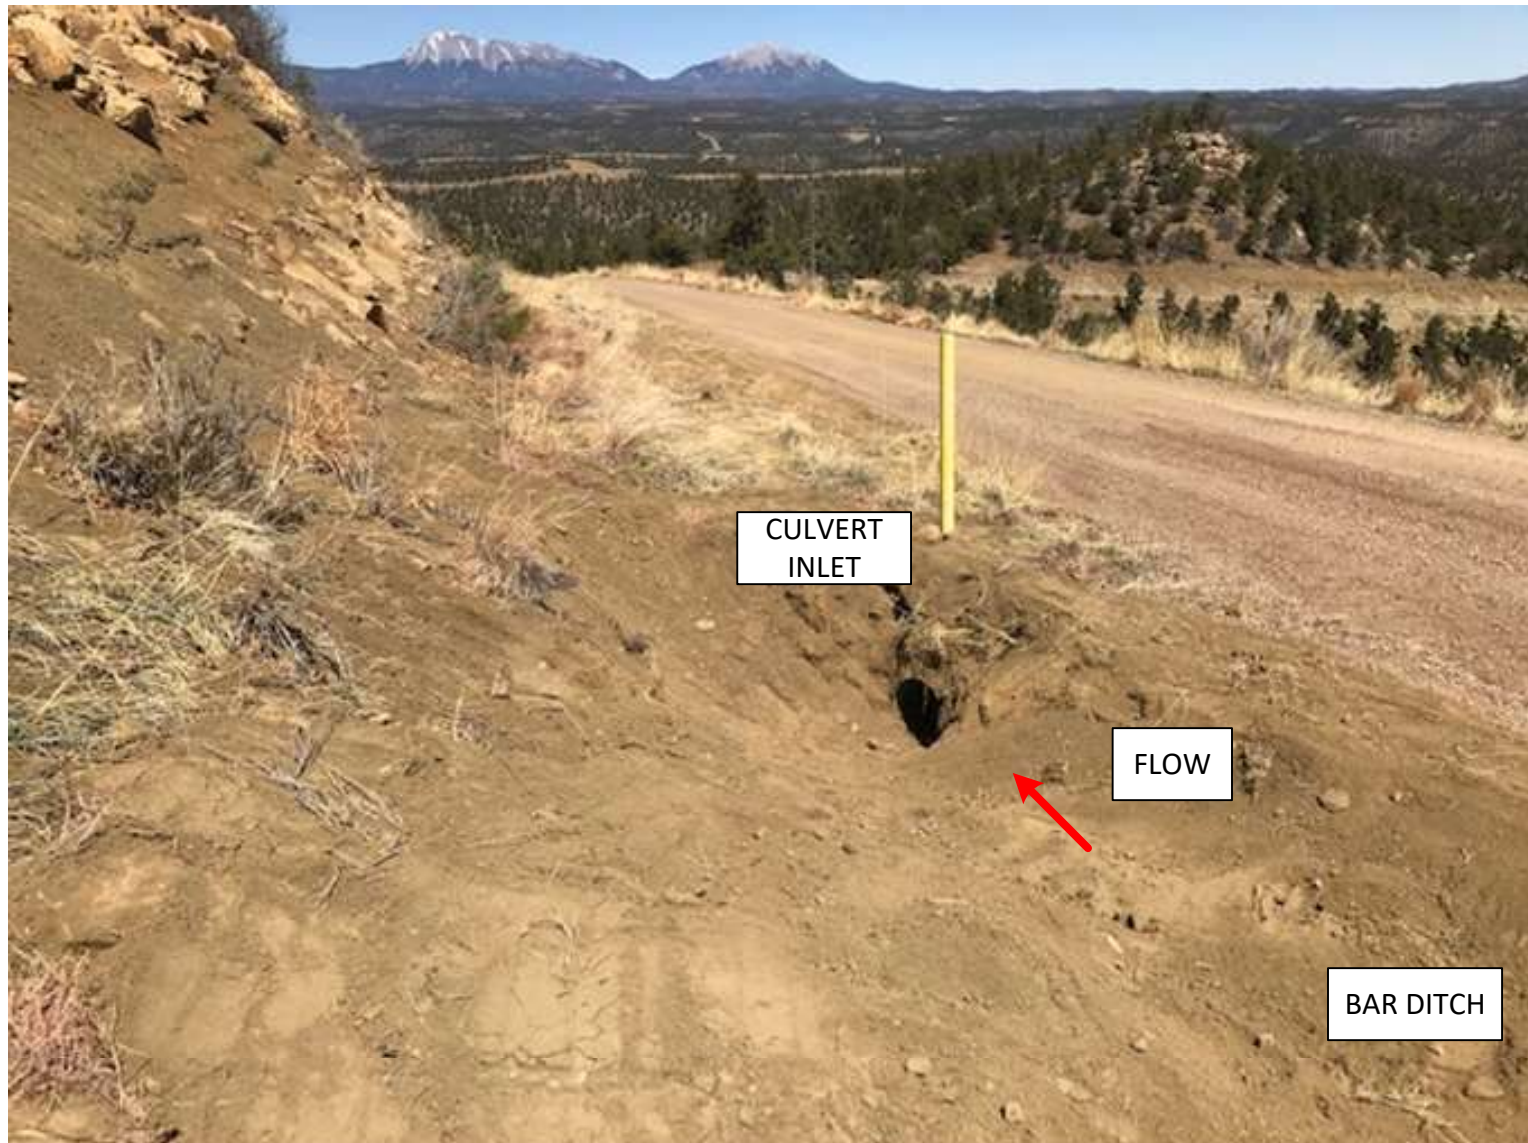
THE SEDIMENT ACCUMULATION WAS REMOVED FROM THE CULVERT INLET ALONG THE ACCESS ROAD.
